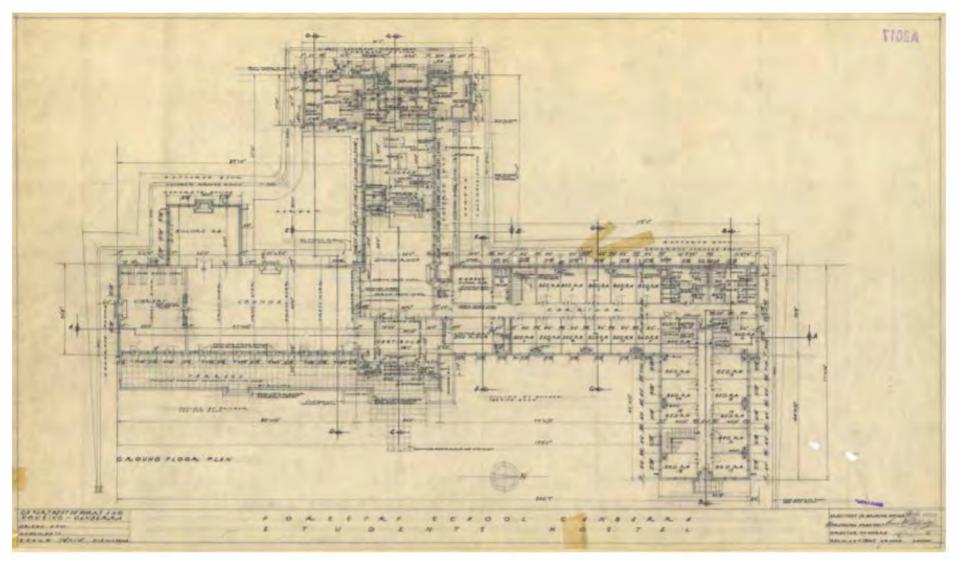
Final ground floor plan for the Forestry School Student Hostel c.1950 (NAA #7689885)
